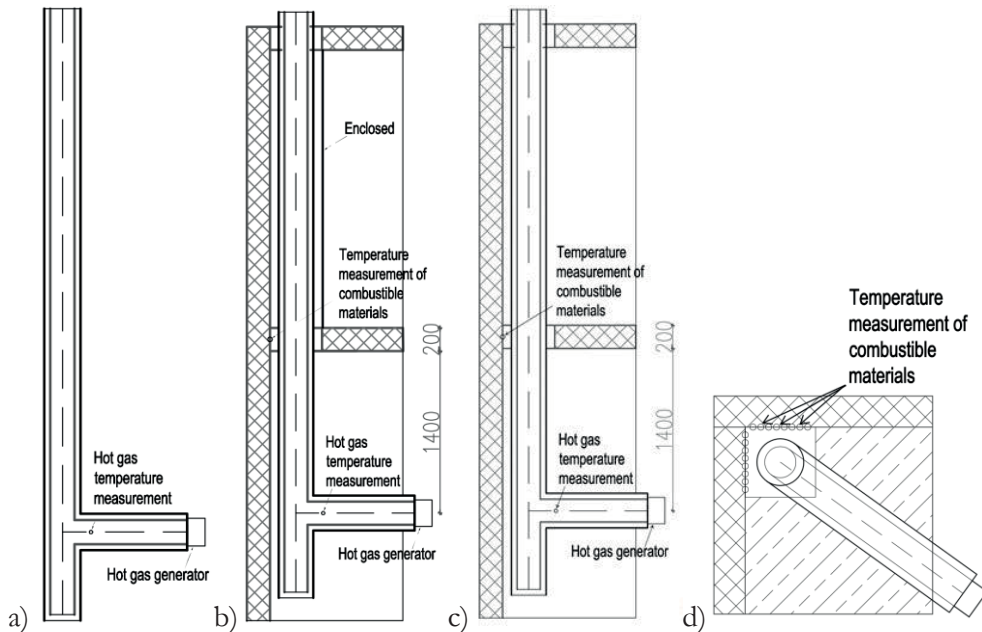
Test arrangements of metal chimney a) Free standing, b) Installed in a corner enclosed, c) Installed in a corner not enclosed and d) Chimneys horizontal section.
